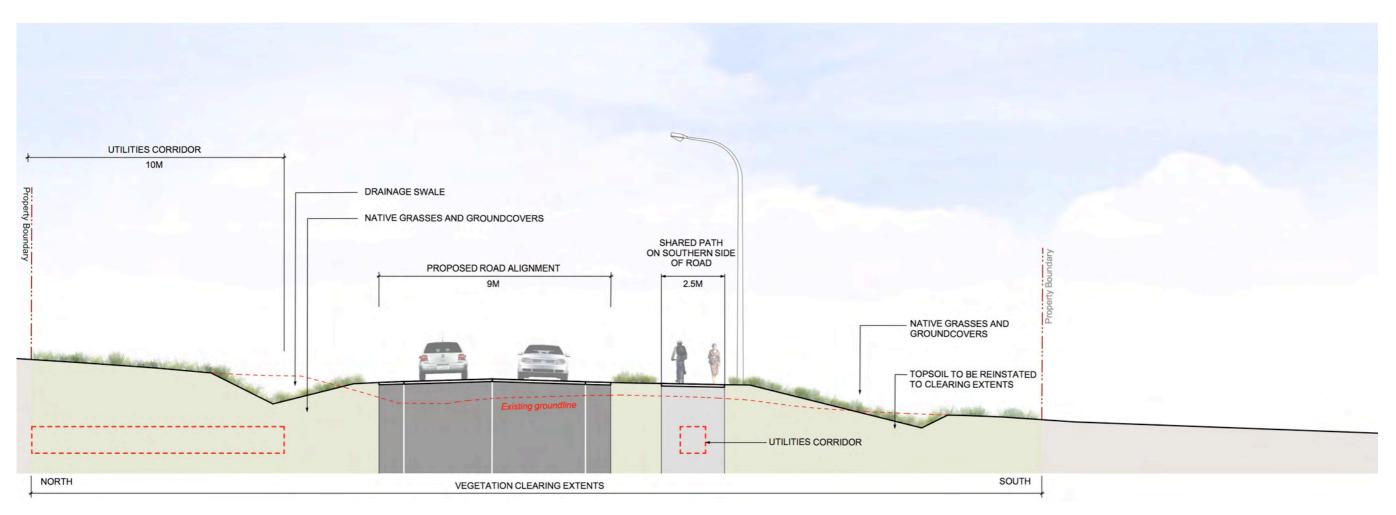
Typical cross section of Parkway treatment in Zone 4, shown at station 8,000
